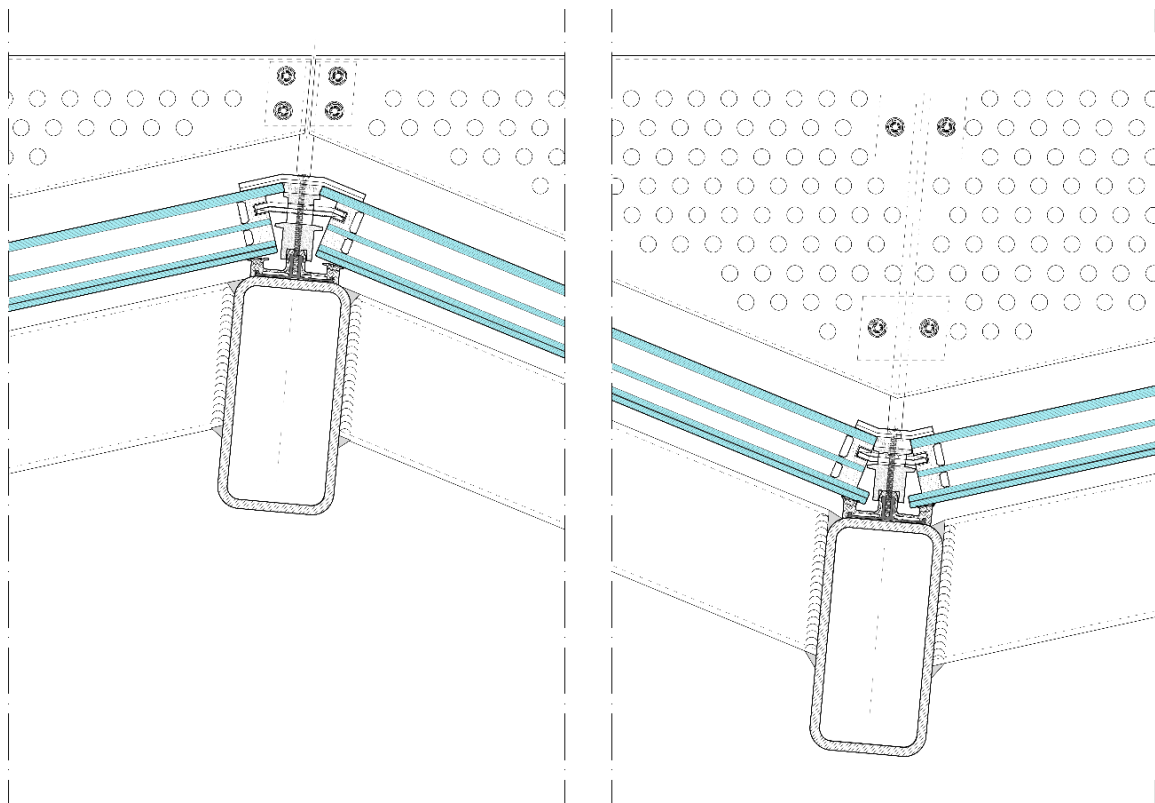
2D horizontal section detail of glass façade system (knippershelbig).
